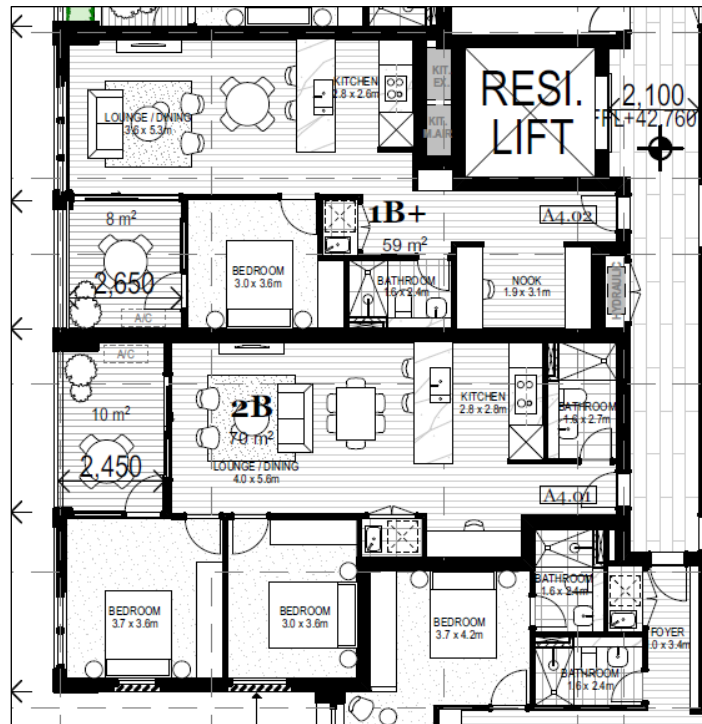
Apartment comparison with living area windows positioned at the rear of the balcony (2B apartment in plan extract) struggling to achieve 2 hours solar access.
